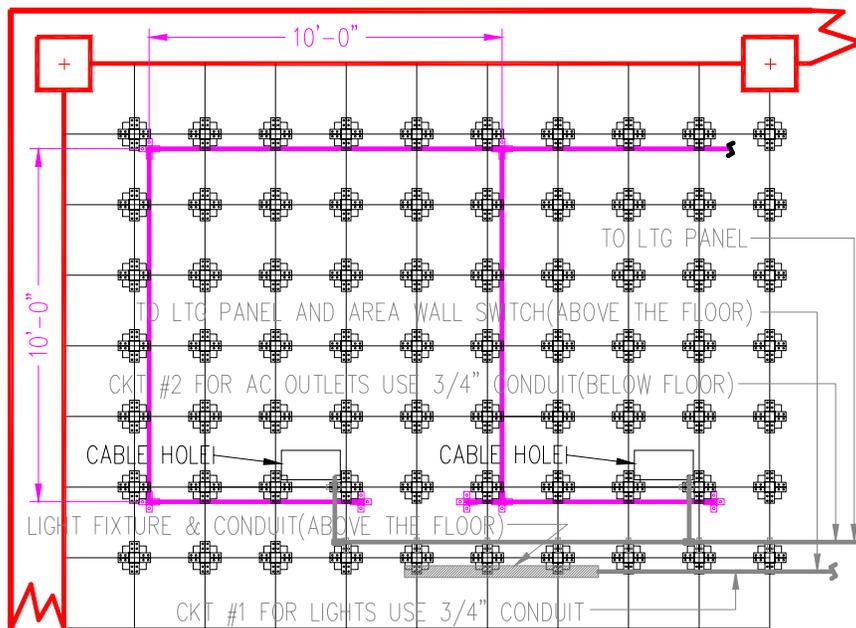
TYPICAL RAISED FLOOR CAGED COLLOCATION AC CONDUIT
